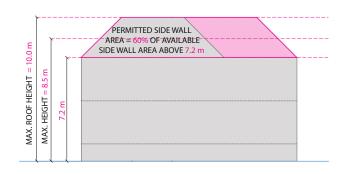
SIDE ELEVATION SHOWING MAXIMUM SIDE WALL AREA
